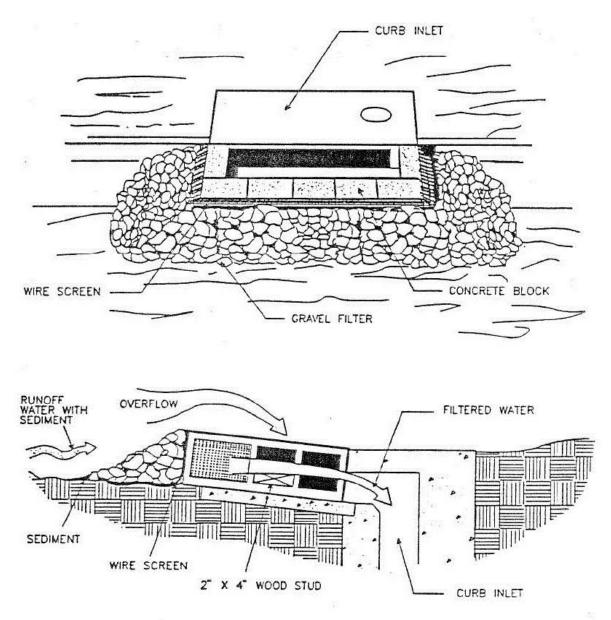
Curb Inlet Protection with 2"x4" Wooden Weir
